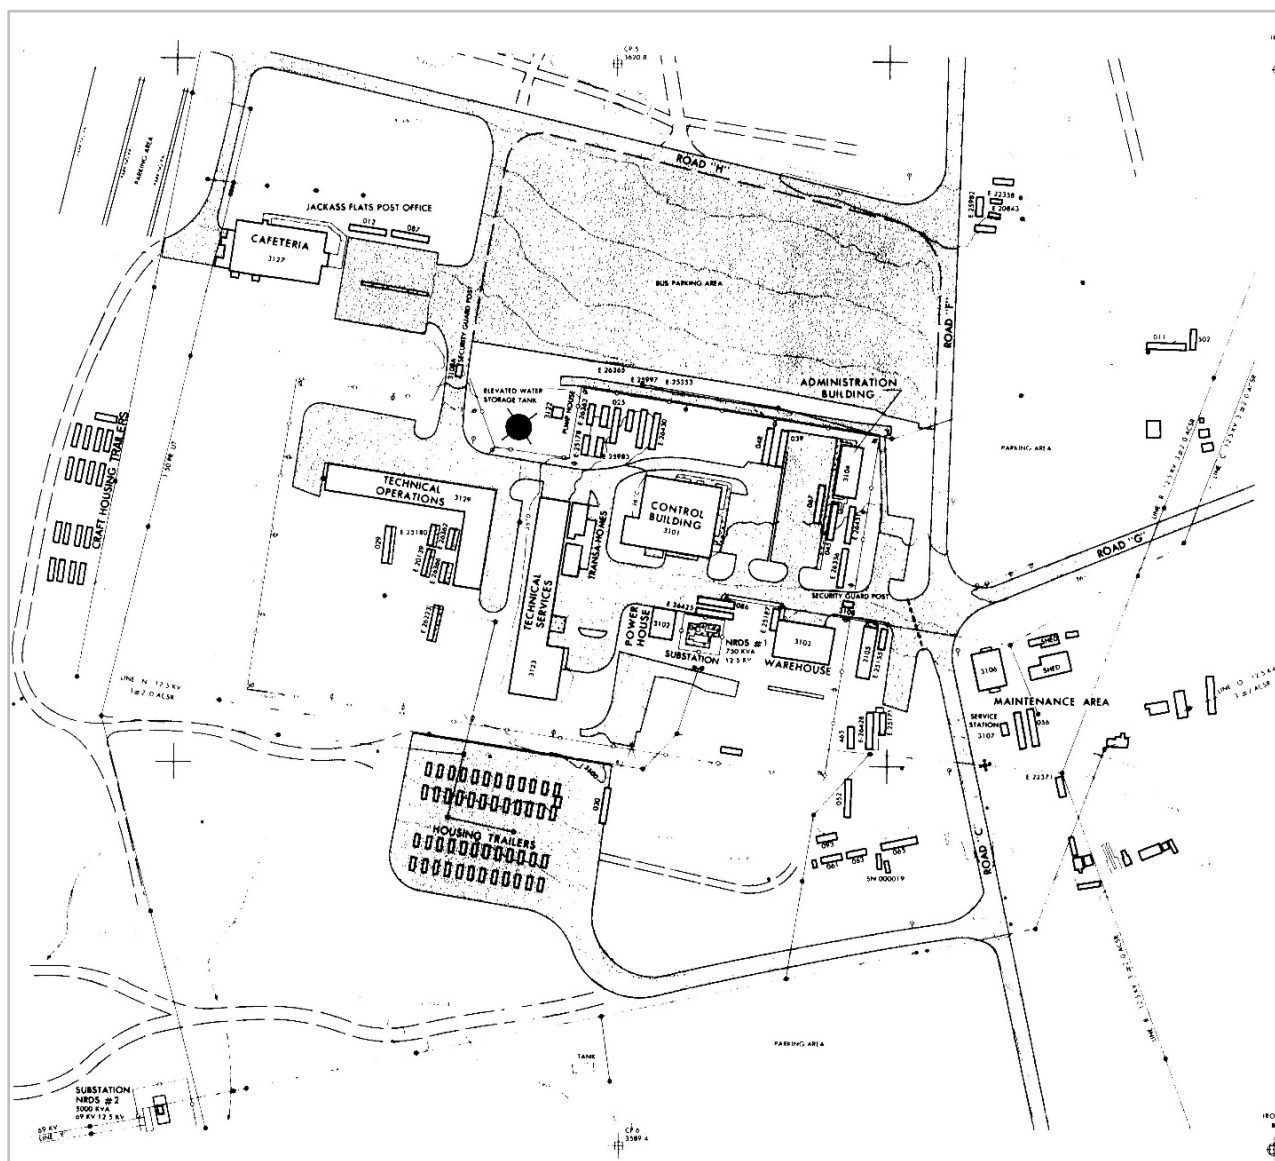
Reactor Control Point plan from NRDS master plan map (Koogse and Pouls Engineering, Inc. 1965).
